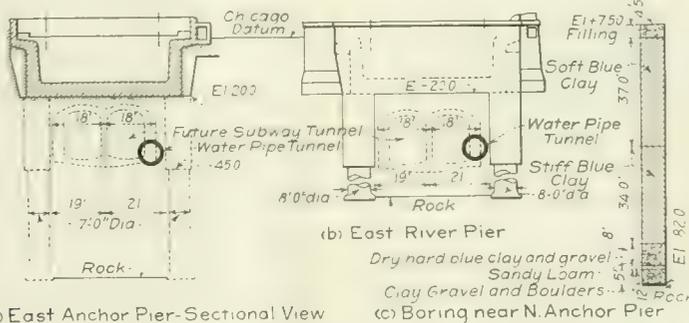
(a) Cross Section of Pit and Elevation of East Anchor Pier of Chicago Ave. Bridge. (b) Front Elevation of East River Pier. Note Locations of Future Subway Tunnel and Water Pipe Tunnel. (c) Boring near N. Anchor Pier.
